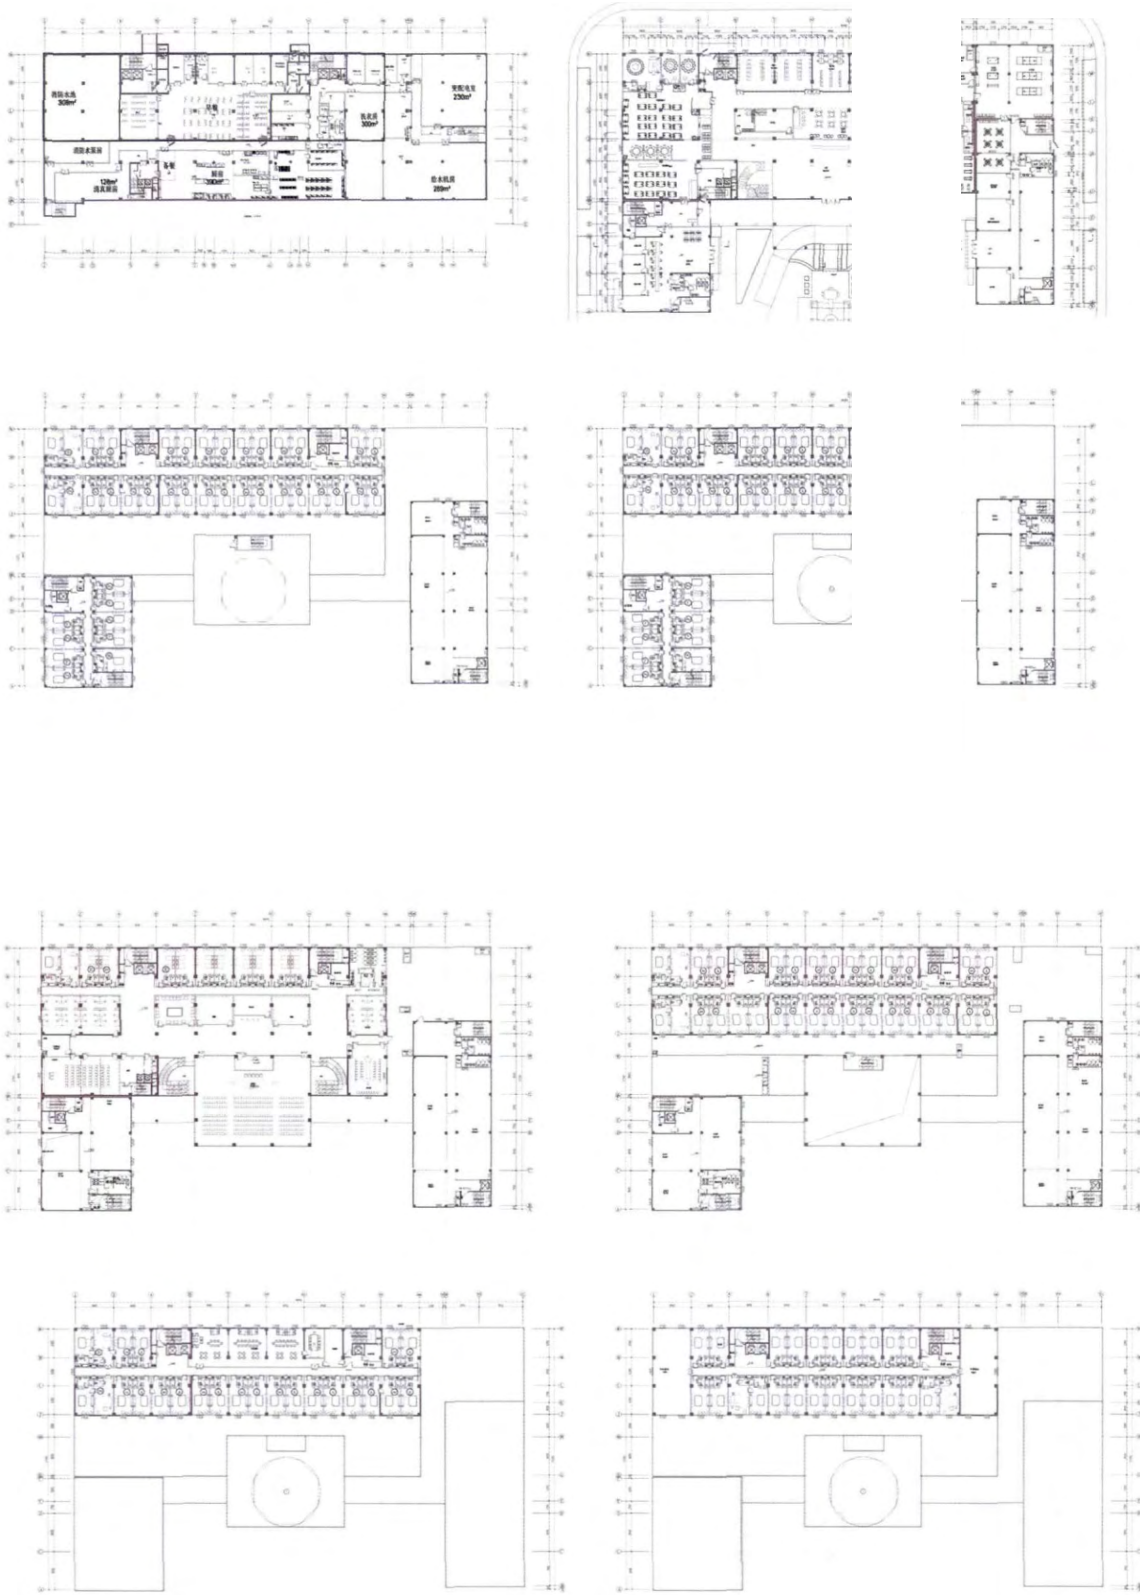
The initial proposed architecture floor plans out of scale Source: Wang Qiang
